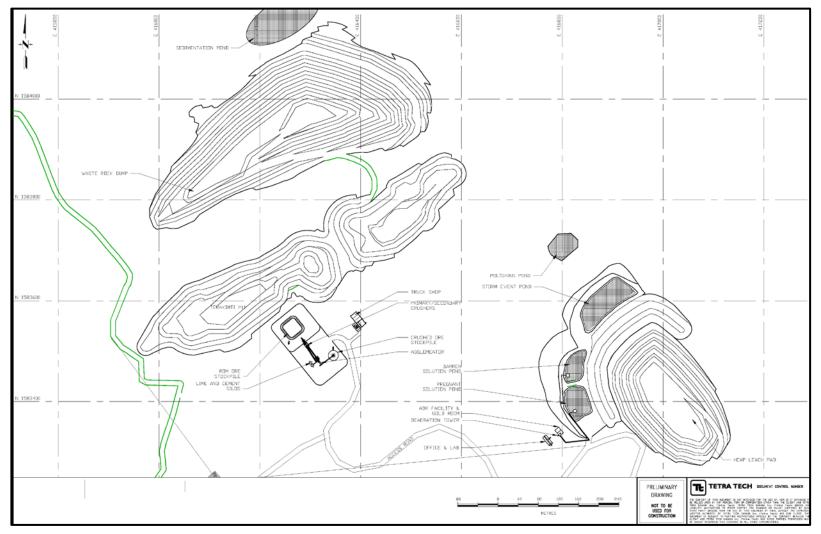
Site Layout for the Terakimti Open Pit and Heap Leach Mining Operation
